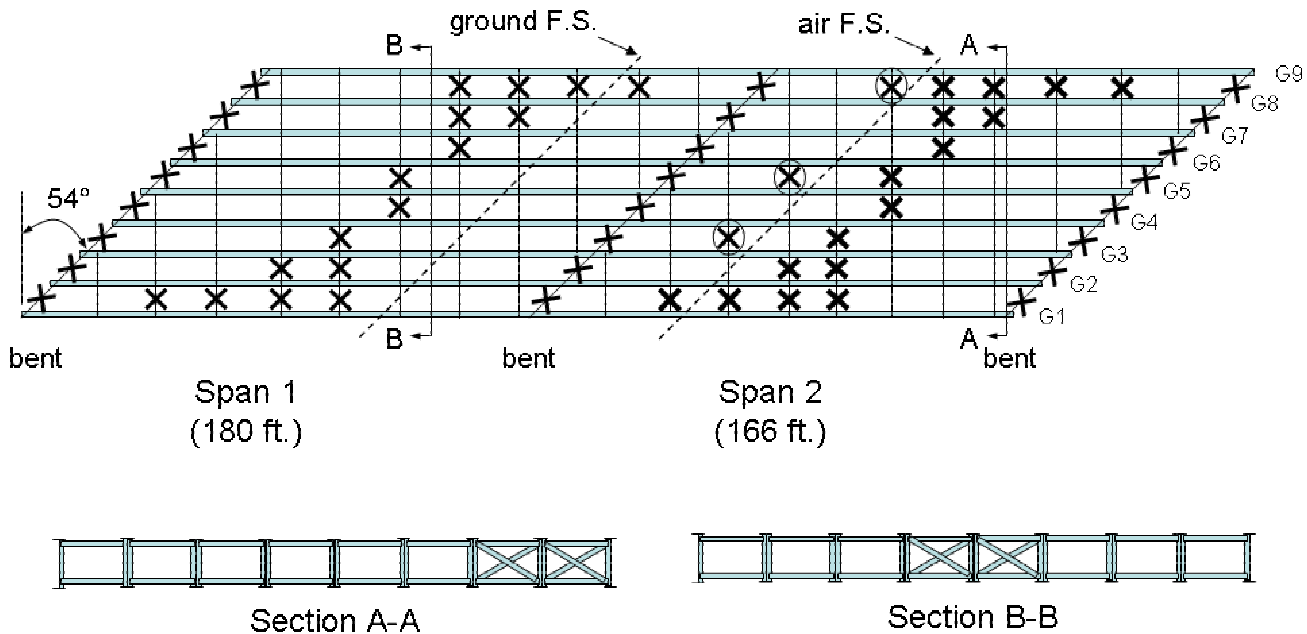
Final Layout of Lean-On Cross-Frames for Nine Girder Implementation Bridge in Lubbock, TX
